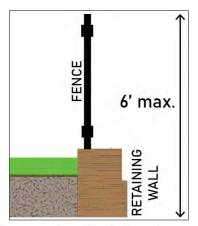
A-2-E-2-I: Requirement for fence location when retaining wall is not adjacent to walkway.
